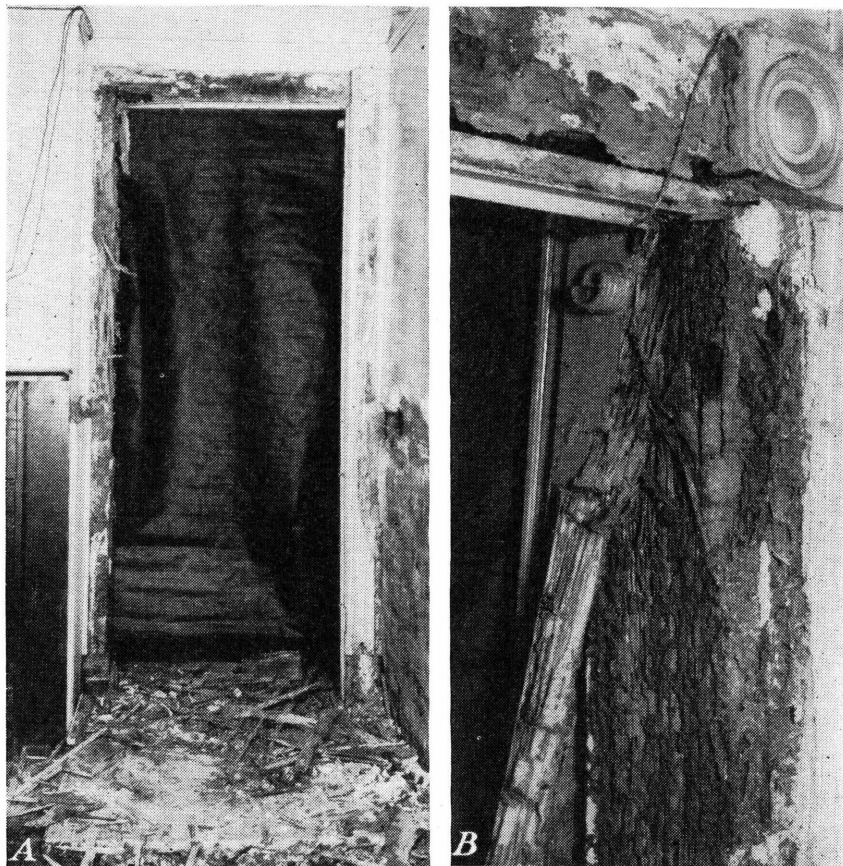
A*, Damaged floor, paneling, and doorframe in basement apartment, as a result of improper insulation of wood from the ground; *B*, part of the door frame shown in *A*.
